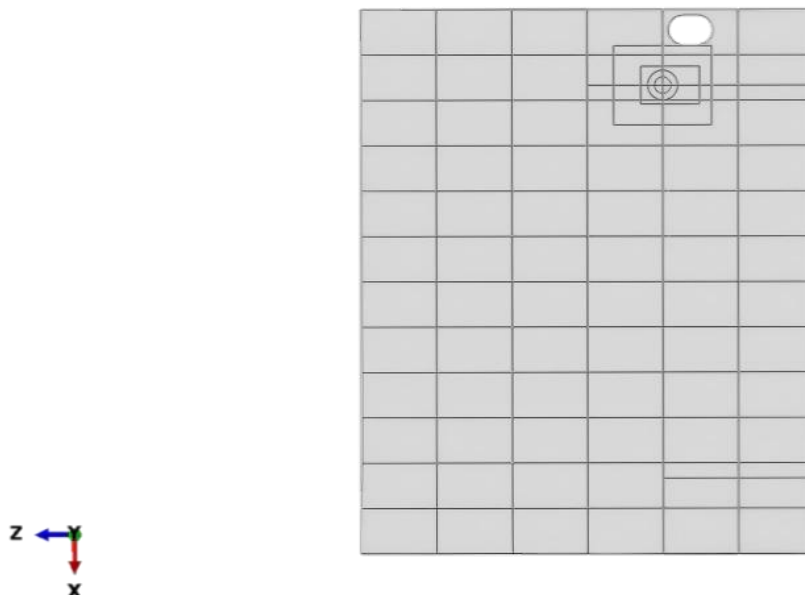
Deck plan showing the layout of longitudinal and transverse reinforcements and columns in Abaqus
